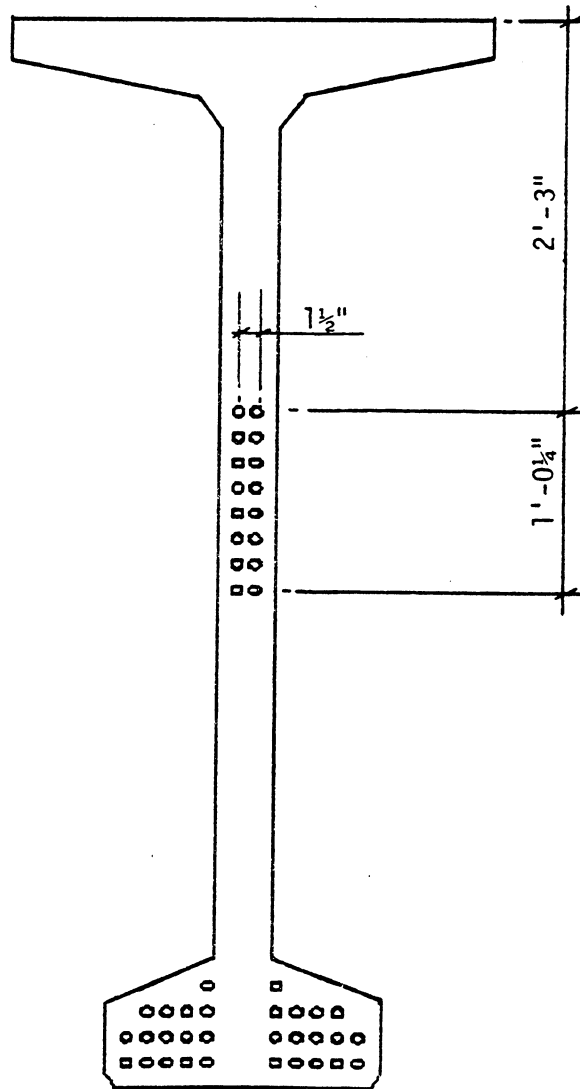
Laboratory Test - View of the Discontinuous End of a Test Girder
